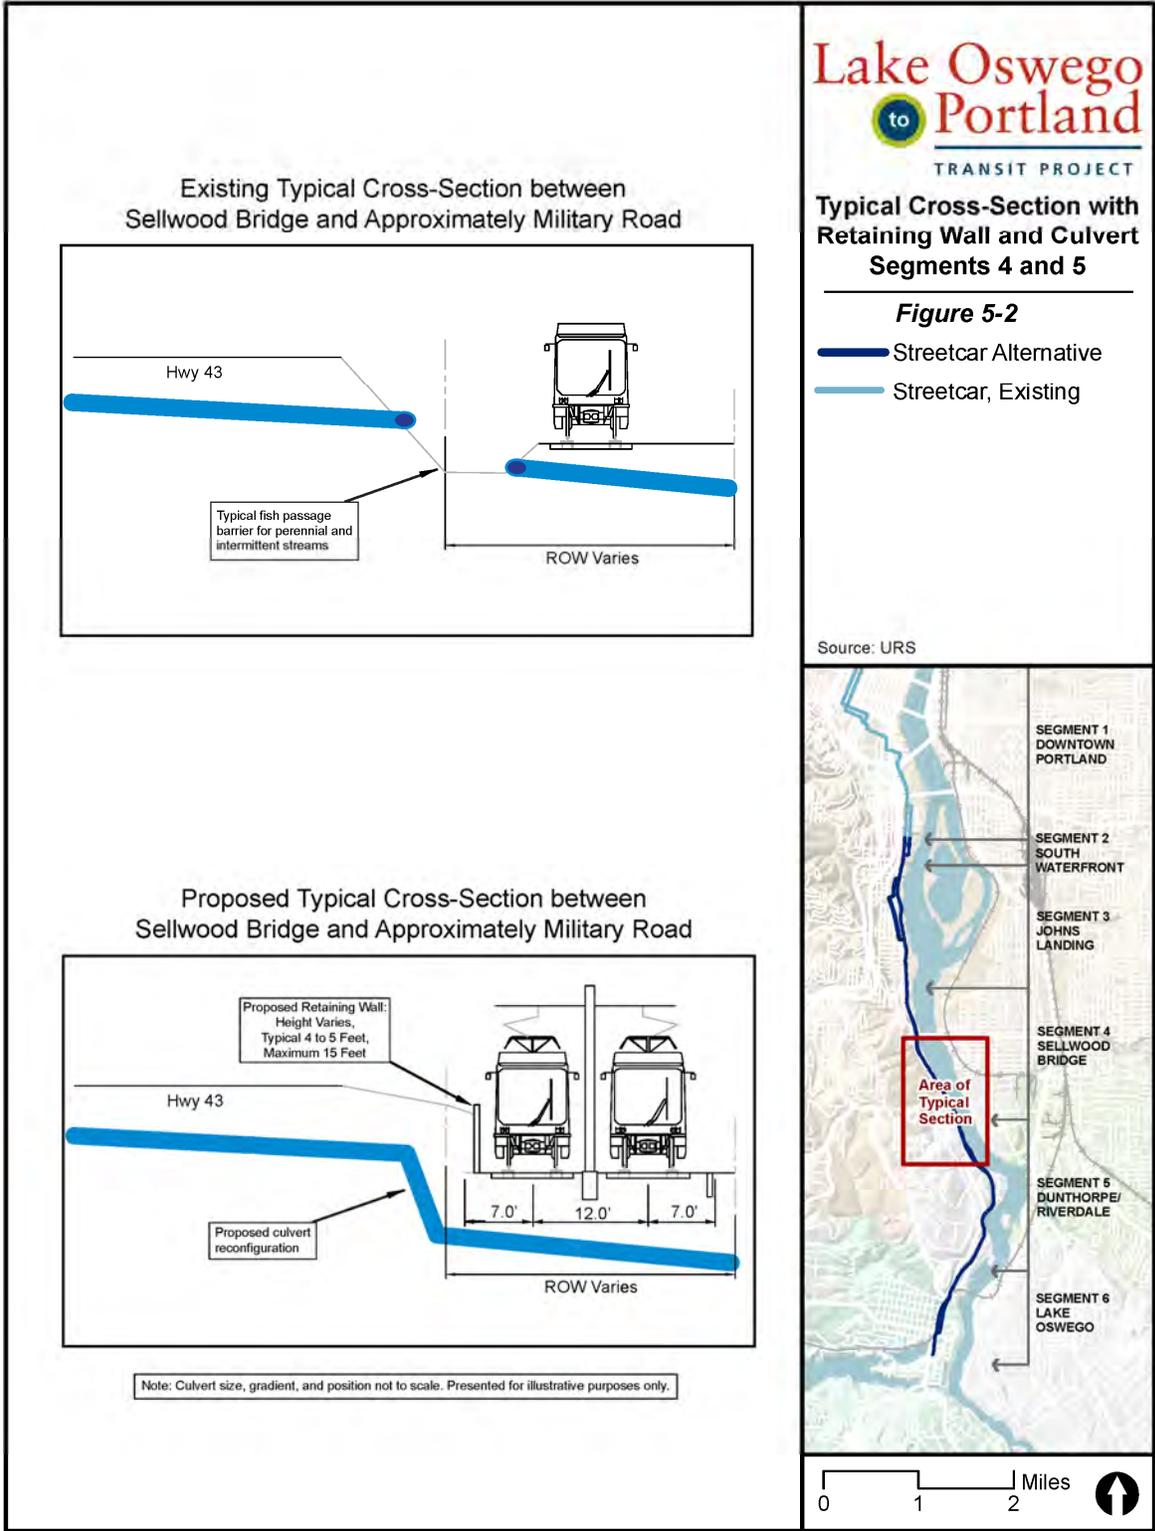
TYPICAL CROSS-SECTION WITH RETAINING WALL AND CULVERT SEGMENTS 4 AND 5
